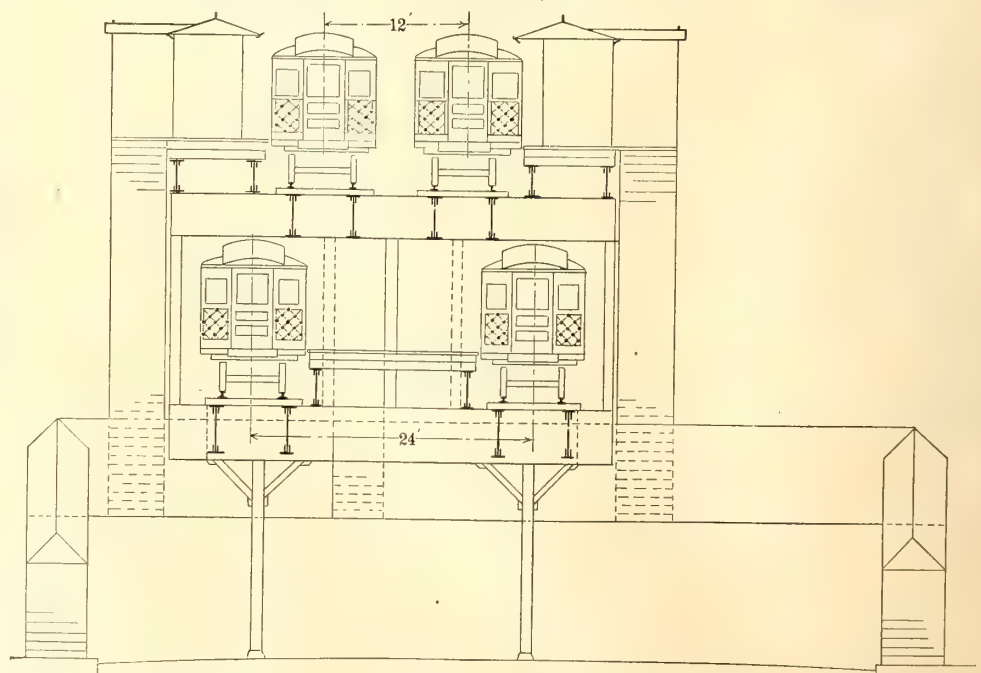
CROSS SECTION OF PROPOSED DOUBLE-DECK STRUCTURE AT 149TH STREET THIRD AVENUE, BRONX BOROUGH
